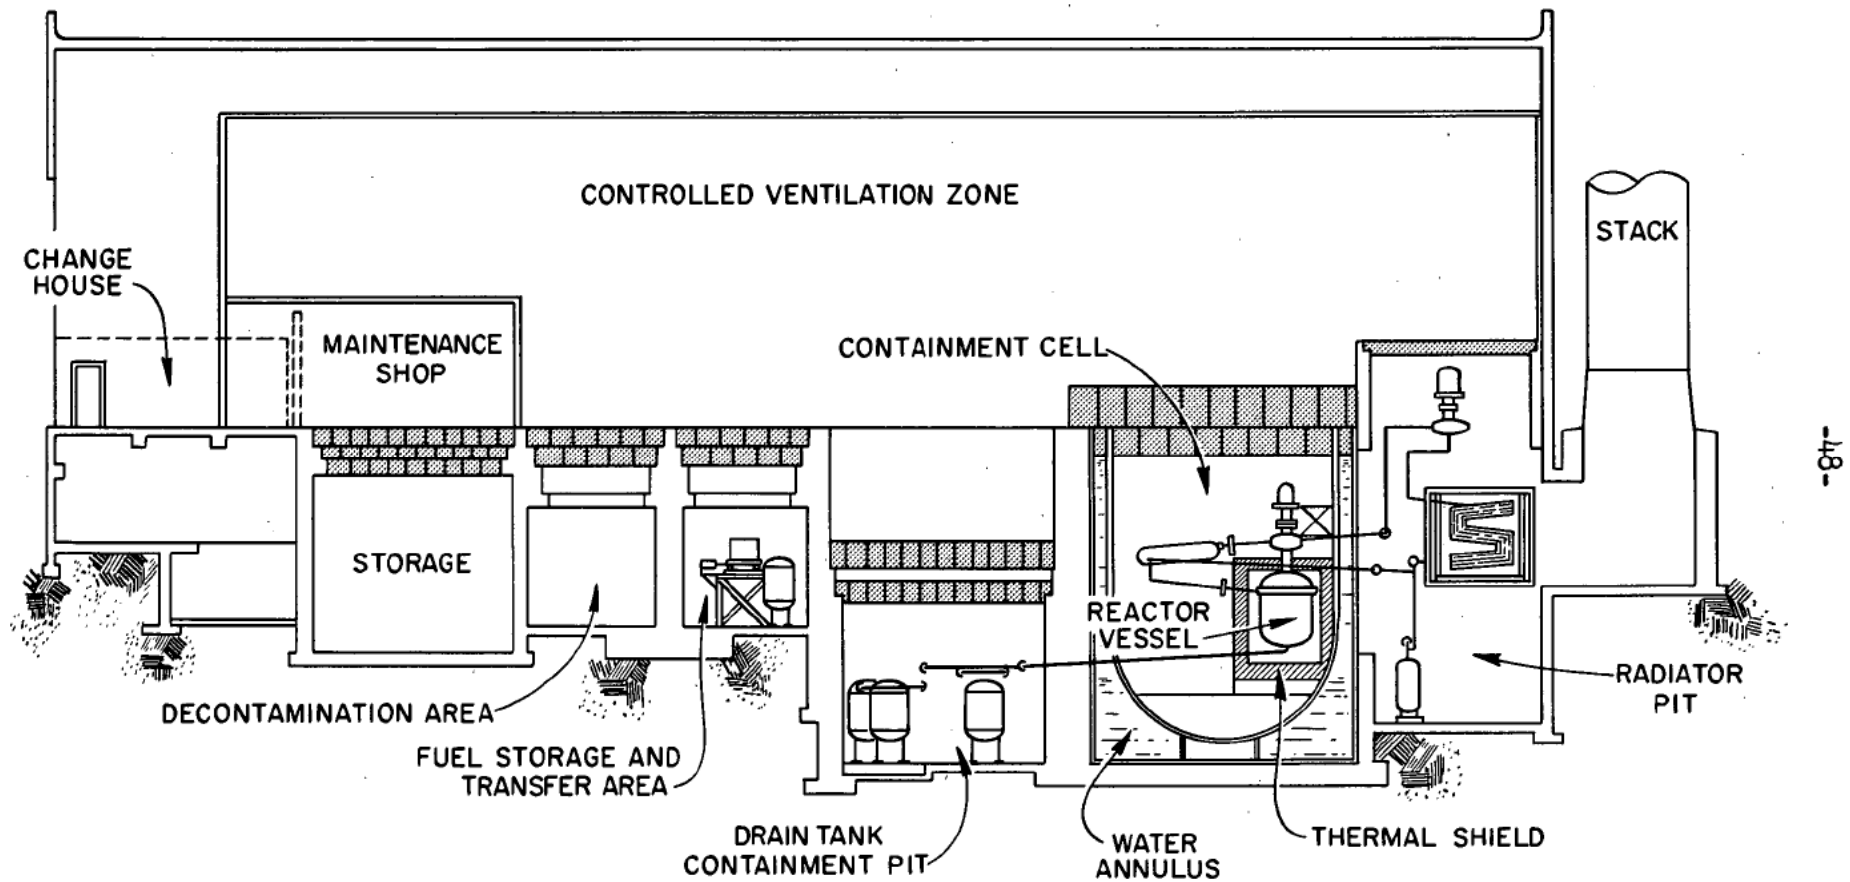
North-South Sectional Elevation - Bldg. 7503
